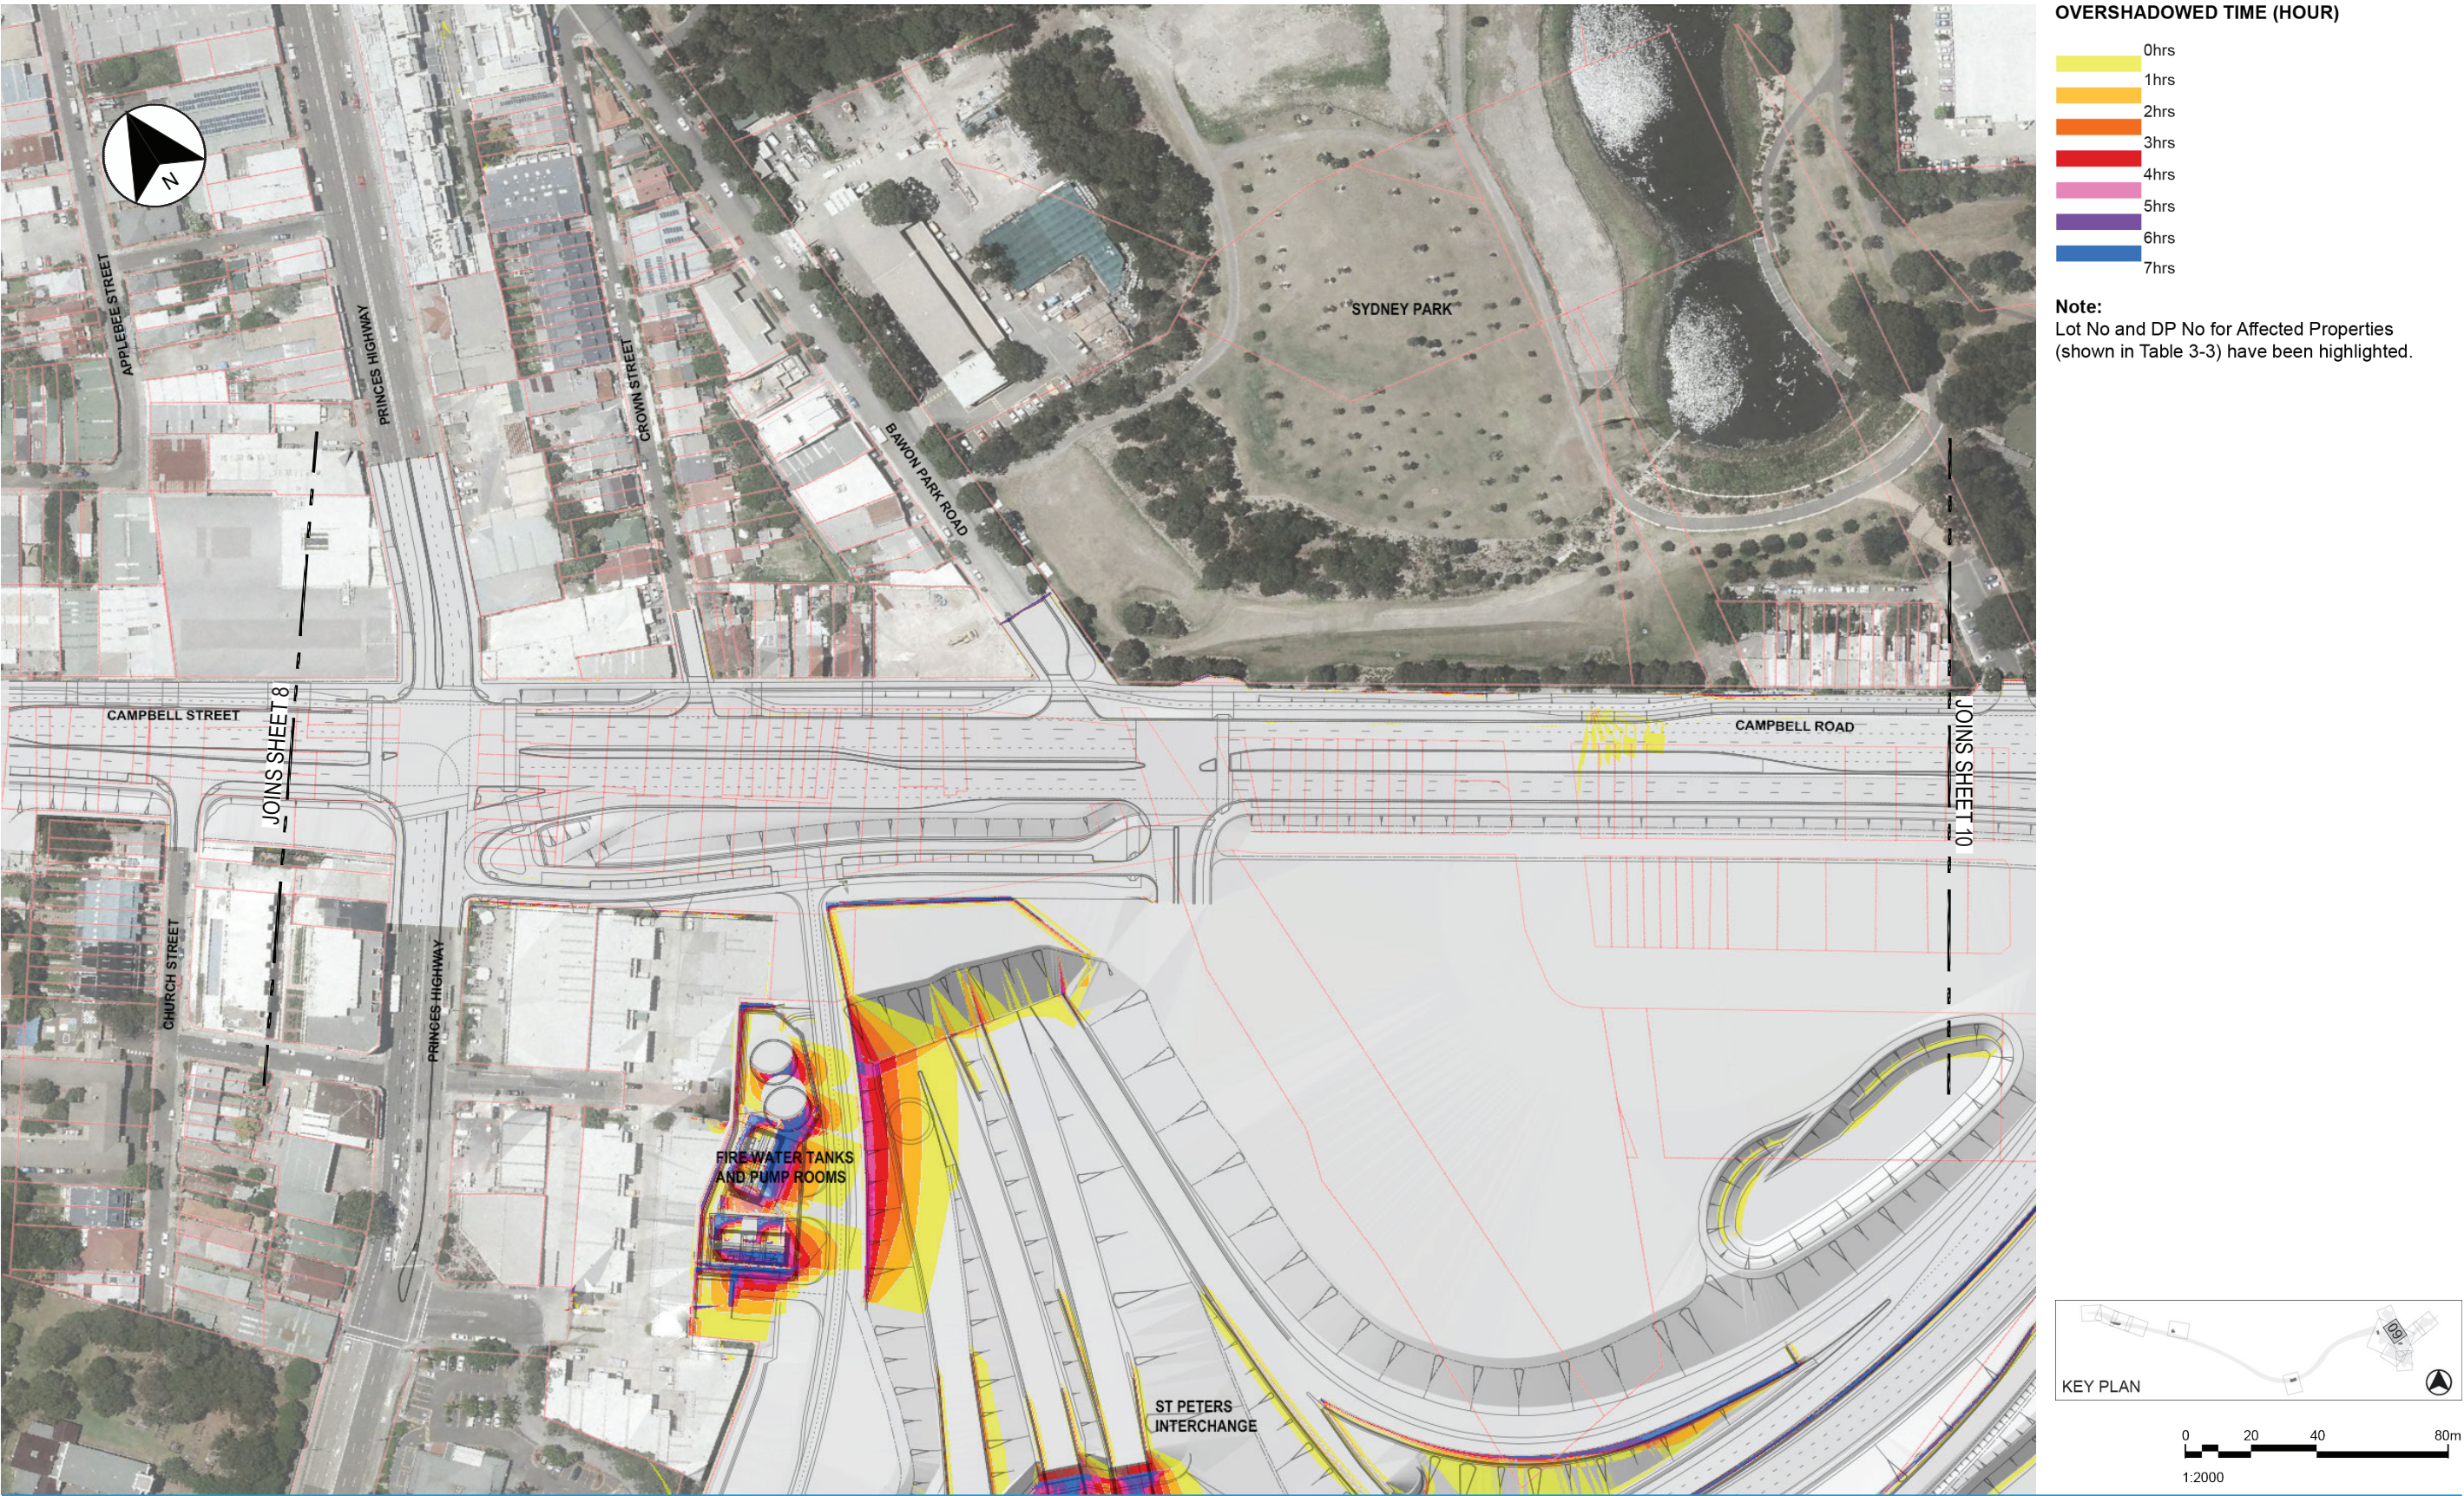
Overshadowing Assessment Plan - Sheet 9 of 14 - 1:2000
